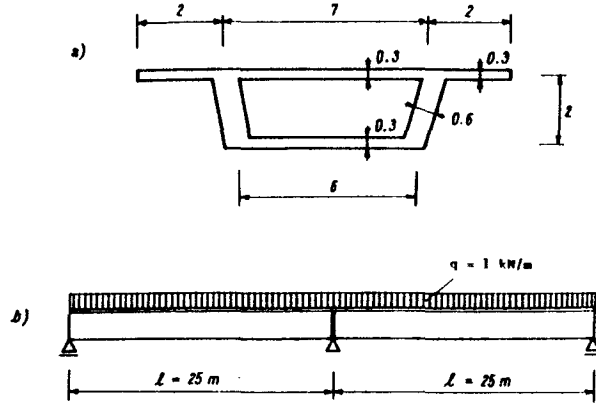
(a) Box Cross Section Considered in Examples; (b) Girder Analyzed in the First Example
